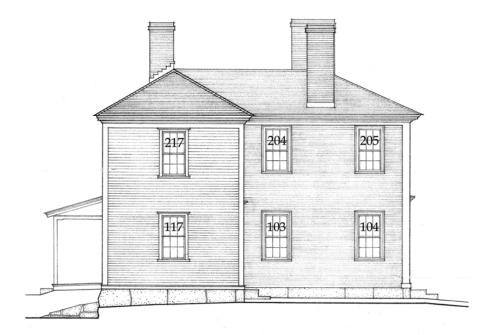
West Elevation with keyed window and door numbers (adapted from HABS drawings).
